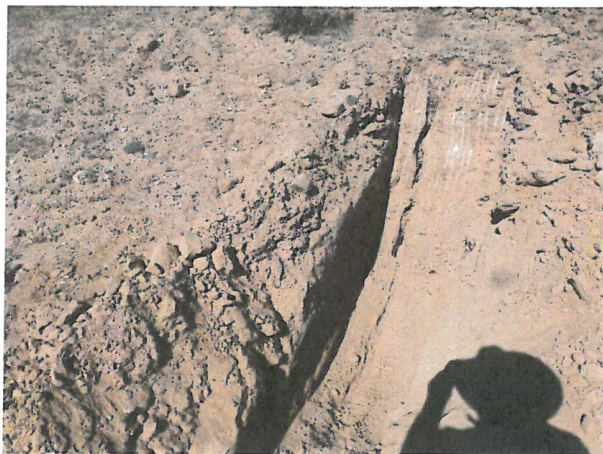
A2-2 – T-5 location: Looking northwest into trench at staining on northwest wall. An approximate 10-inch diameter hole into chimney drain material is located center photo.
